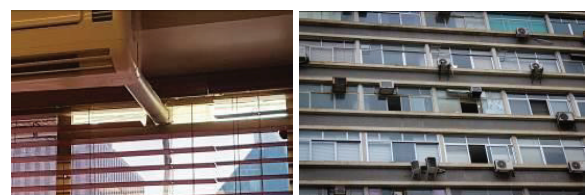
On the left, room 3, details of windows showing gaps in the glass. On the right, view of the facade of the CCN facing Paulista Av. showing air conditioning machines as well as windows opened for natural ventilation.
